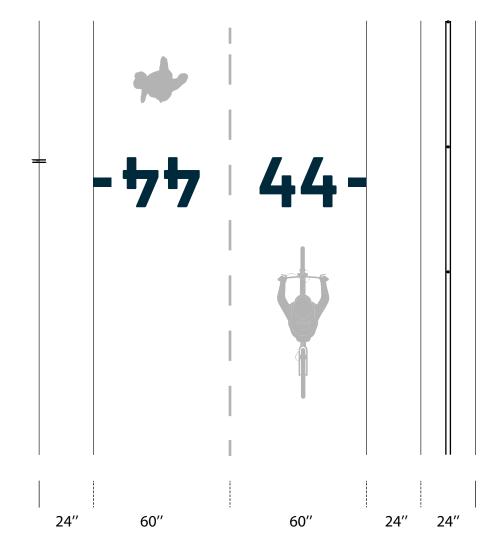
Pavement markings should be placed so that they face the direction of travel.
